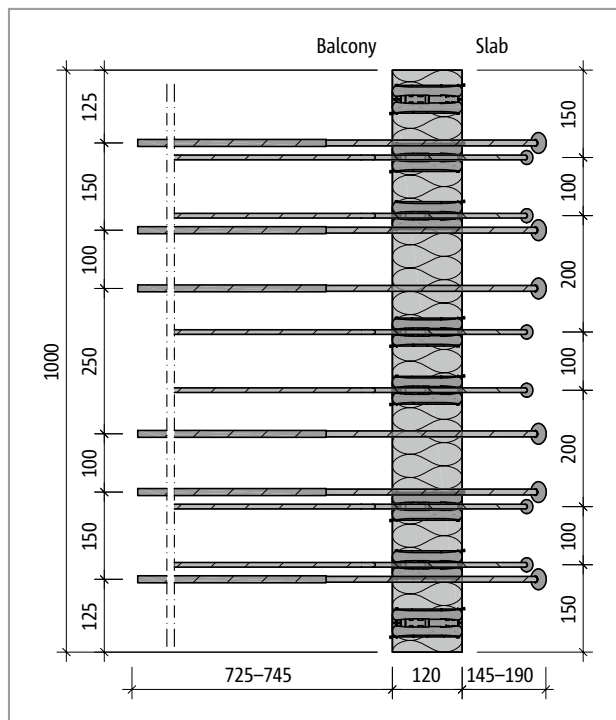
Schöck Isokorb® XT type K-O-M2: Product plan view
